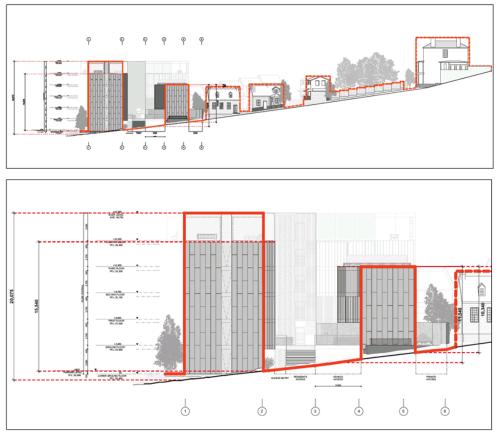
Western elevation demonstrating the distinct building forms and height transition along Wilmot Street (source: Room 11 Architects)
